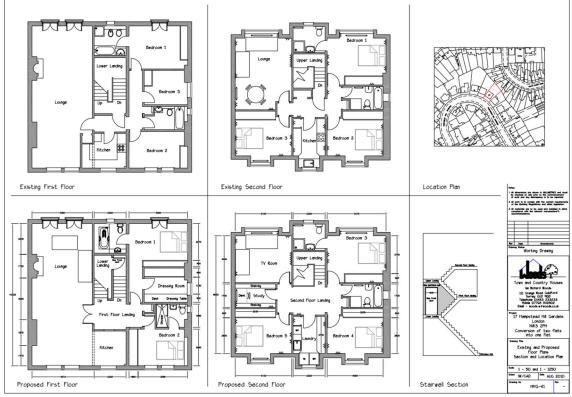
Existing and Proposed (Approved) drawings describing the merging of First and Second Floor flats into a single dwelling, as Approved under 2010/6190/P.
